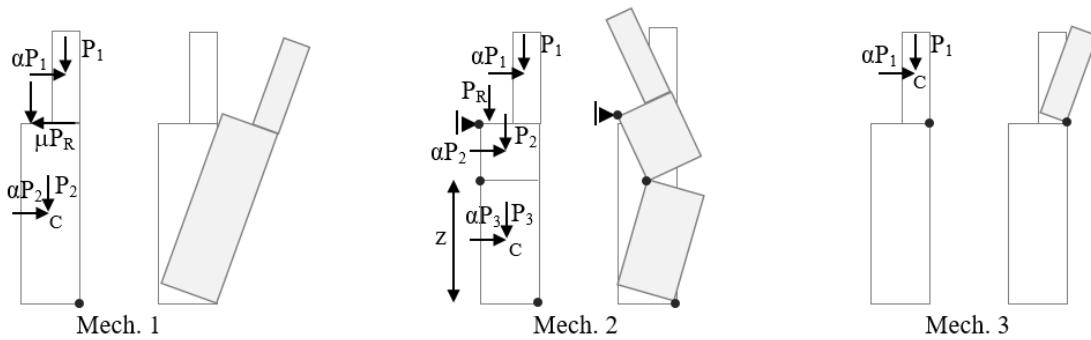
Configuration and actions involved in the mechanisms: Mech. 1 – overturning of the central pier, Mech. 2 – flexural mechanism of the central pier and Mech. 3 – overturning of the parapet
